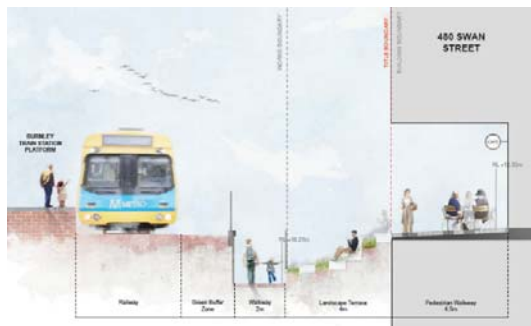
A sectional diagram of the proposed landscaped terrace to the south of the development.
